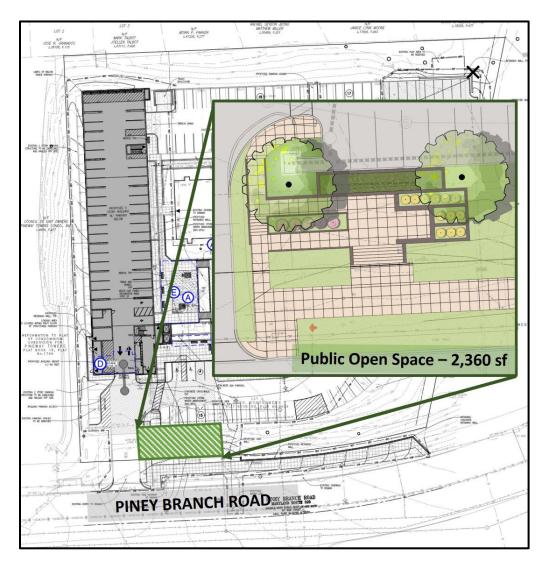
Proposed Public Open Space fronting on Piney Branch Road
